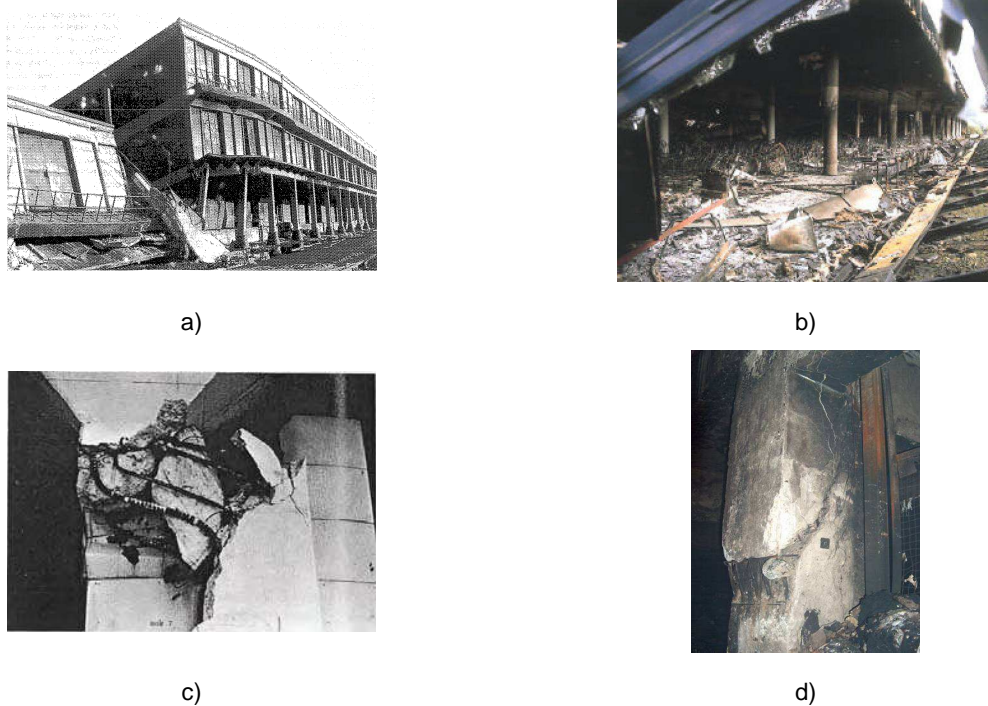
Examples of structural collapses induced by shear failure due to thermal elongation: a) port of Ghent warehouse [23]; b) library of Linköping [35]; c) U.S. Military Personnel Records Centre building [34] d) shear failure of a column during cooling [17].
